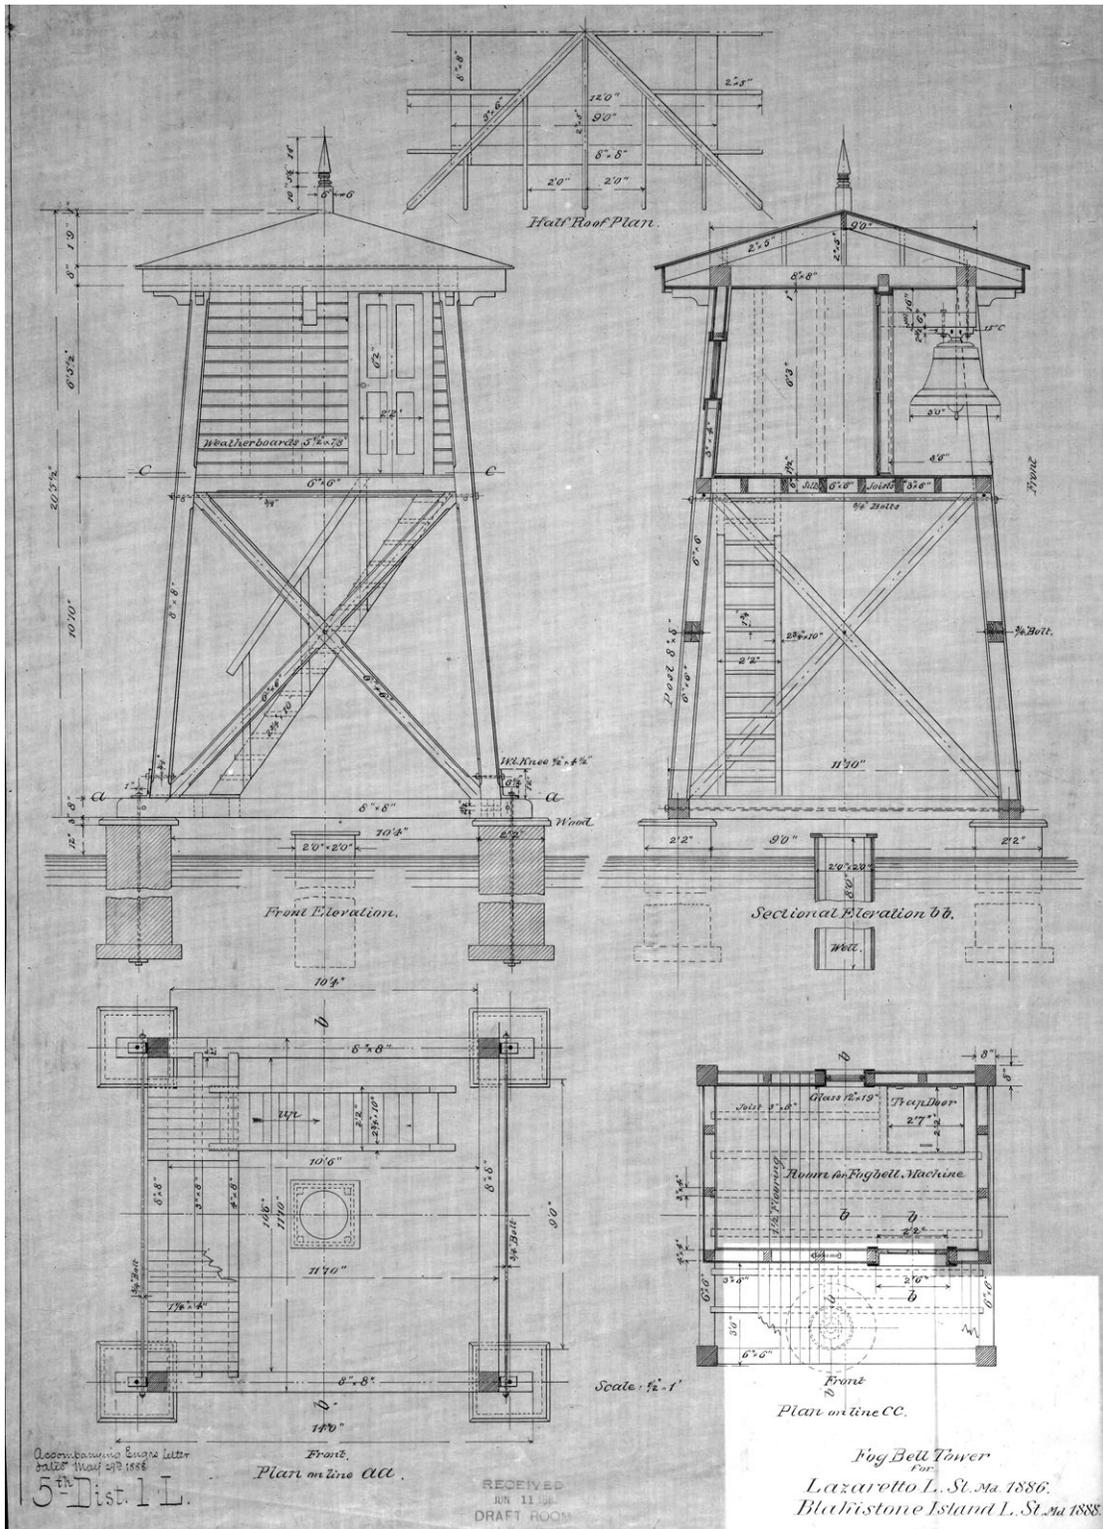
Drawing of fog bell tower built at Lazaretto and Blakistone Island Light Stations, both in Maryland. National Archives Record Group 26.
